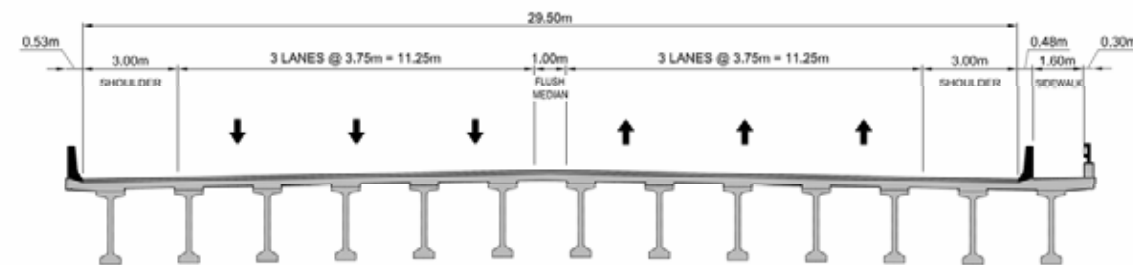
TYPICAL CROSS-SECTION – APPROACH BRIDGE
